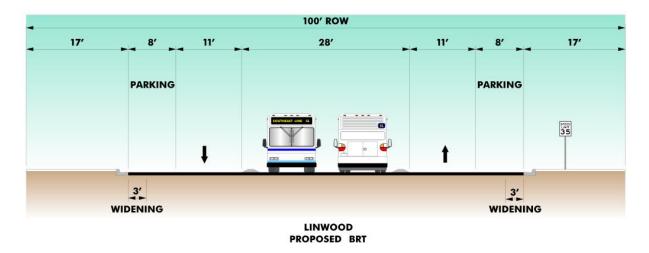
Bus Rapid Transit Linwood Blvd Typical Section
